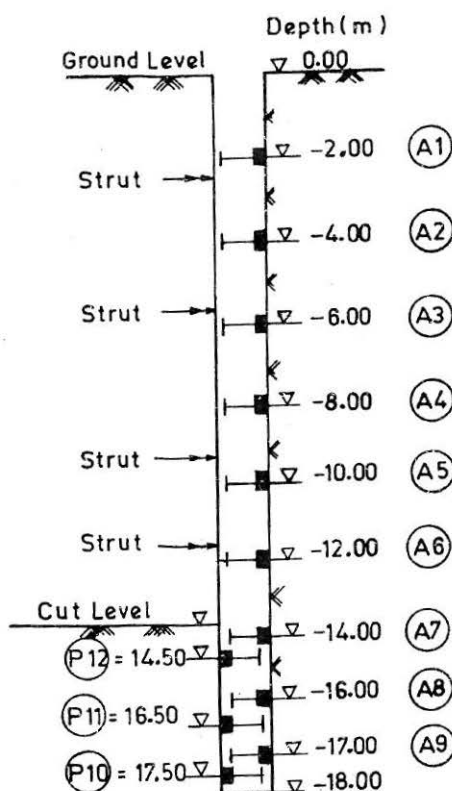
Location of Earth Pressure Cells in Diaphragm Wall
